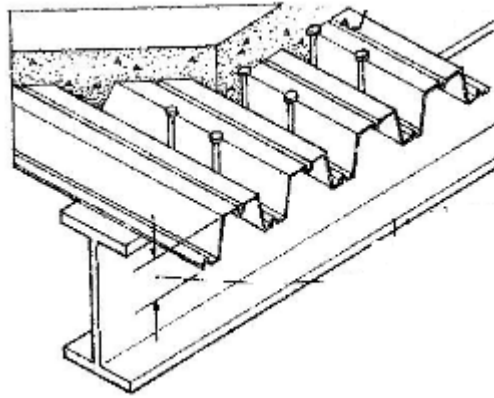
1.5" LOK-floor decking with 3" concrete slab (Ching, 2008)
